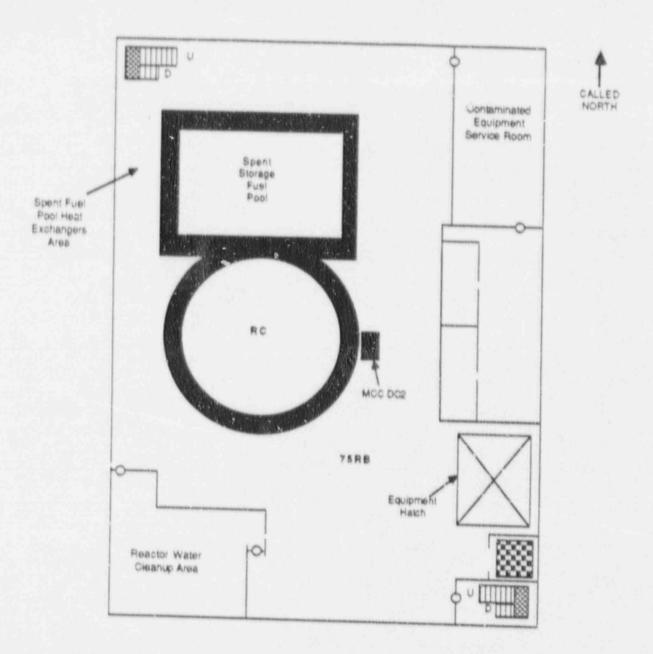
Oyster Creek Reactor Building - Elevation 75'-3"
